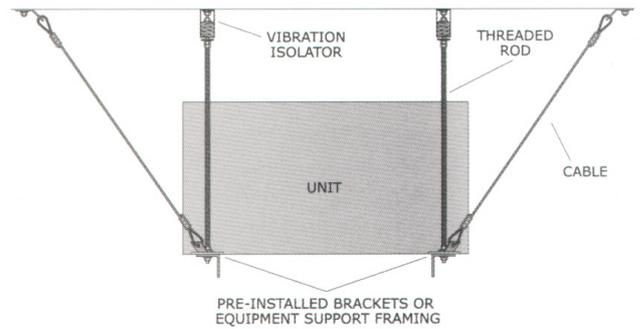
Typical installation of suspended equipment with threaded rods, vibration isolation hangers and wire rope bracing (FEMA, 2002).
